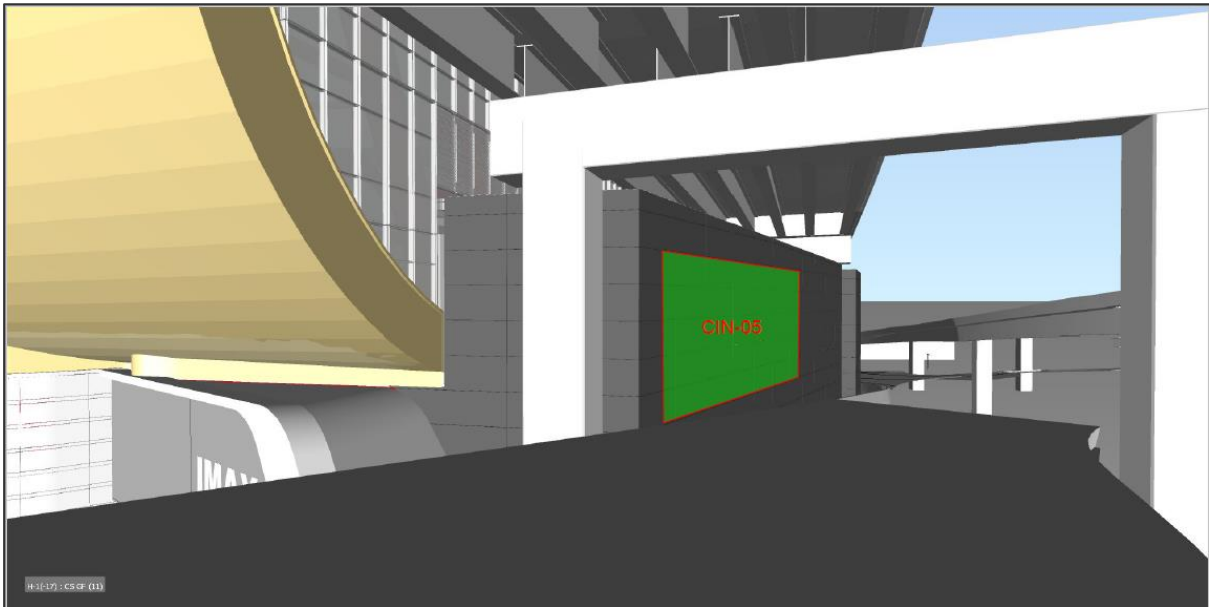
| West view of signage zone CIN-05 from the road deck (source: Applicant’s RtS)
